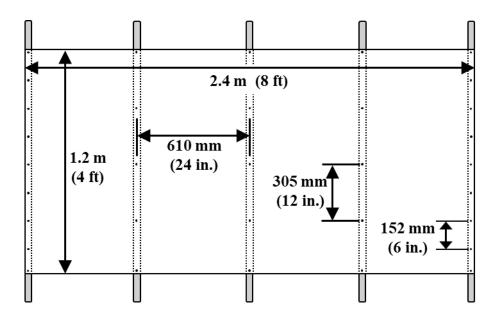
1. Typical construction for roof up-lift test samples. Nailing pattern shown is typical code minimum 152/305 mm (6/12 in.) This layout results in 33 nails per panel, with 9 nails on edges and 5 nails in the field.
